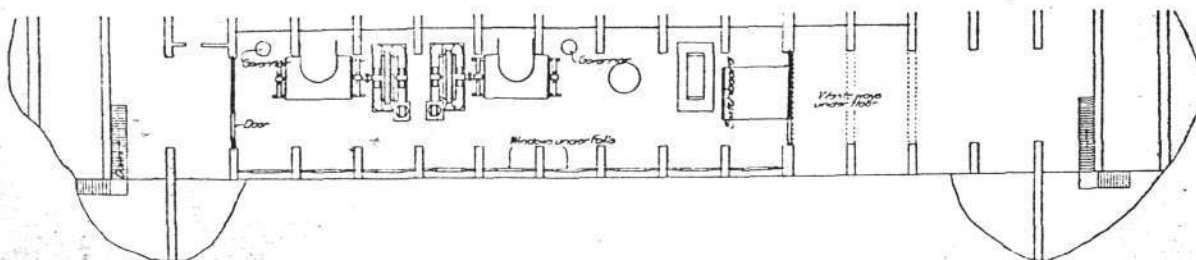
PLAN VIEW OF DAM, SHOWING LAY-OUT OF MACHINERY.
